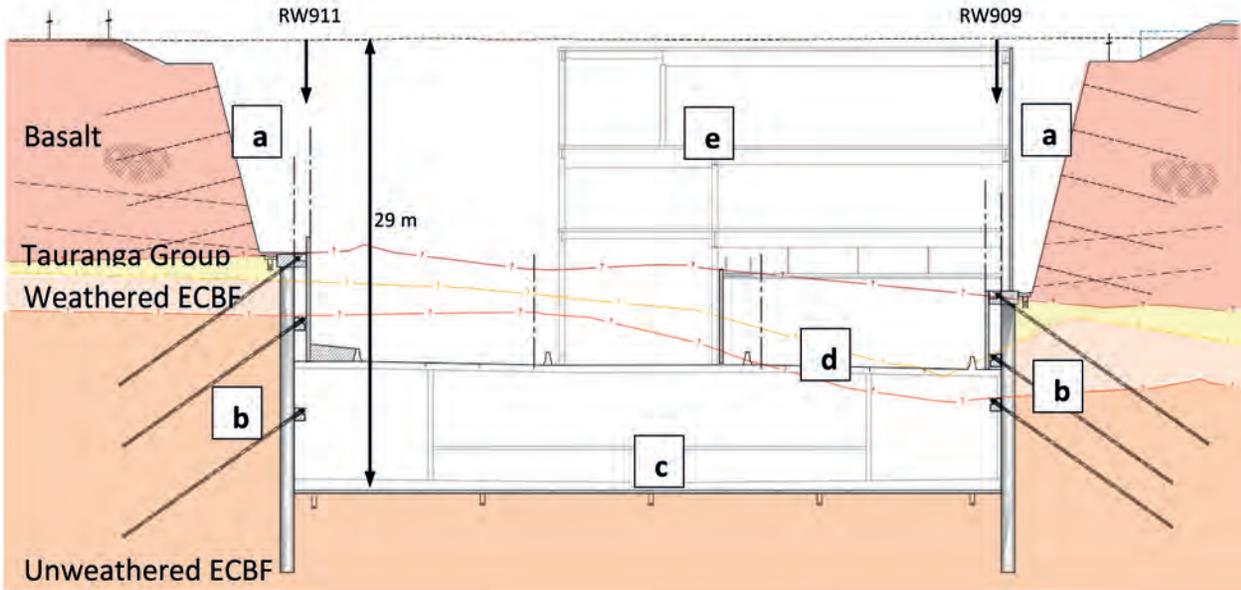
General arrangement of Southern Approach Trench 20 m south of tunnel portal. a) Basalt cut, b) Anchored bored pile walls, c) Portal sump, d) Road deck, e) Southern Vent Building
